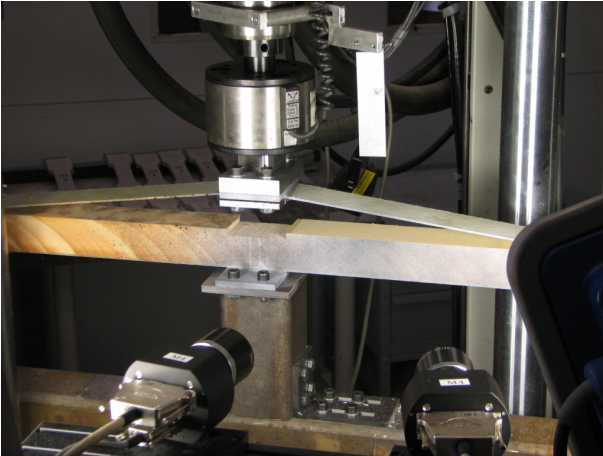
Loaded specimen in tensile test machine. Notice cameras and speckled pattern on specimen used for measuring displacement of specimen surface.
